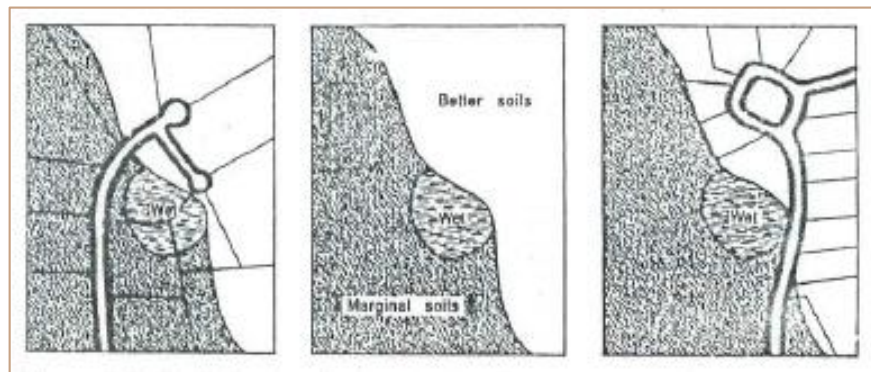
Lot size reduction advantage to locate home on better soils, making it easier to fit minimum legal requirements as well.
